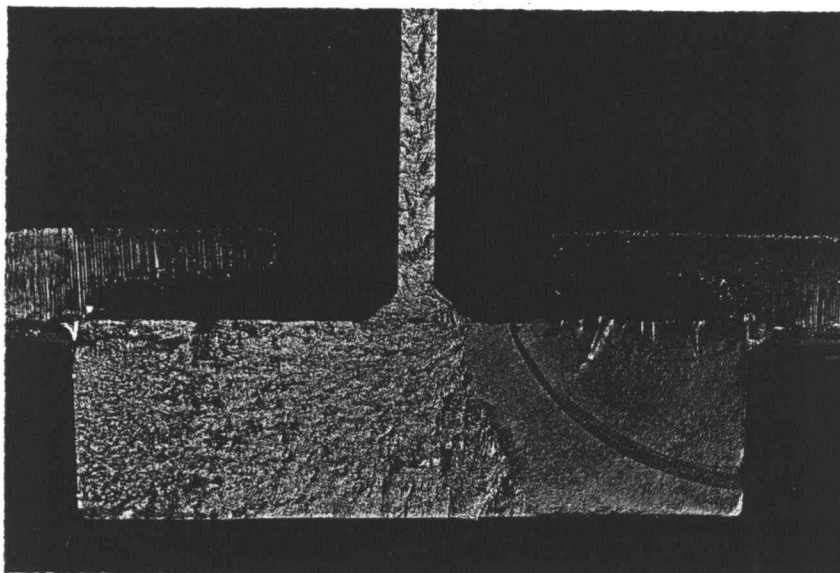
Fatigue Crack Growth from Fillet Weld Toe of Lap-Welded Gusset Plate¹²
